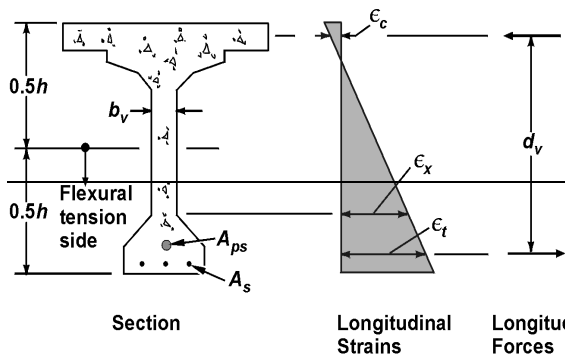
Longitudinal Strain, ϵ_x , for Sections Containing Less than the Minimum Amount of Transverse Reinforcement.
